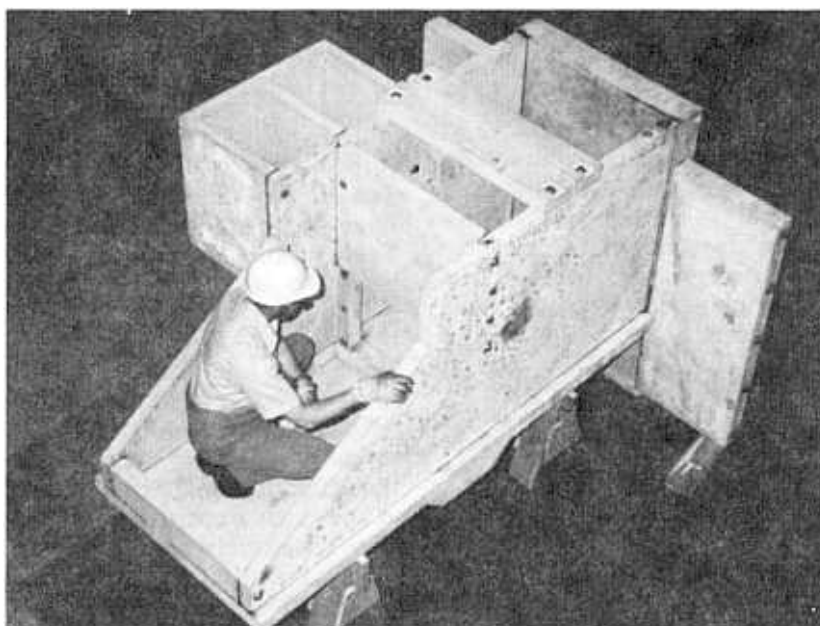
Front (canal-side) view of assembled PIC CHO. Photo 801-D-80846
